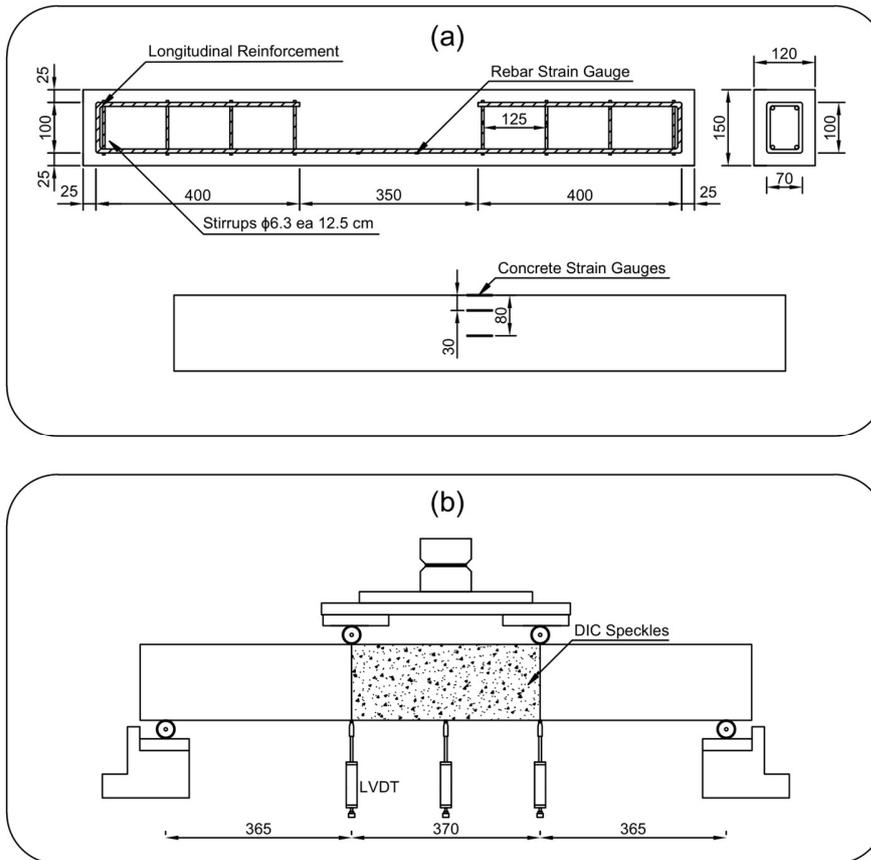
Setup illustration: (a) reinforcement configuration and gauge positions and (b) setup with LVDTs disposal. Dimensions in mm
